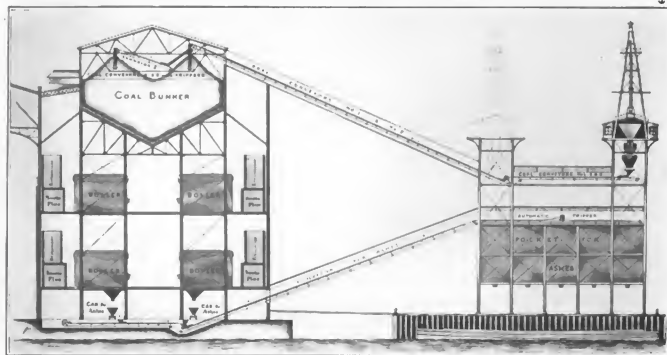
HANDLING COAL AND ASHES AT THIRD AVENUE RAILWAY PLANT, NEW YORK
